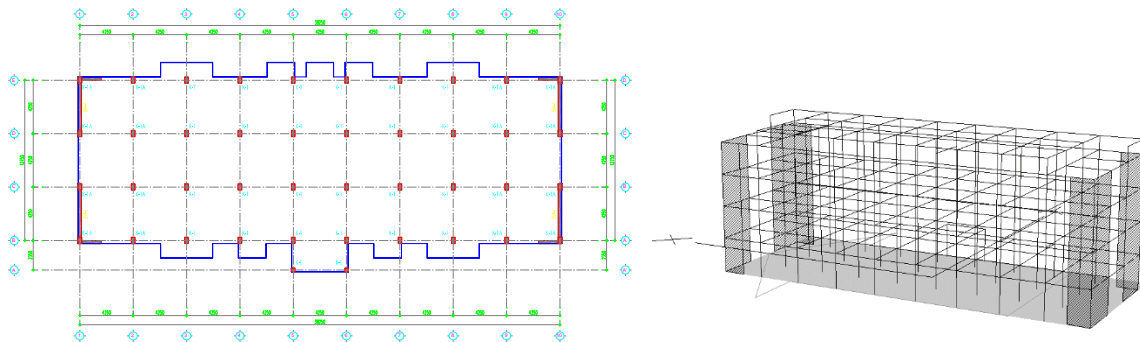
Modeling of the building; (a) typical plan; (b) STERA 3D model
